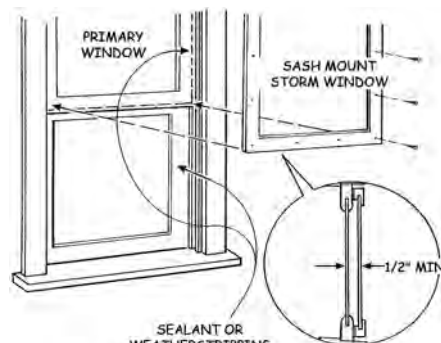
INTERIOR ATTACHMENT FOR SASH-MOUNT STORM WINDOWS
